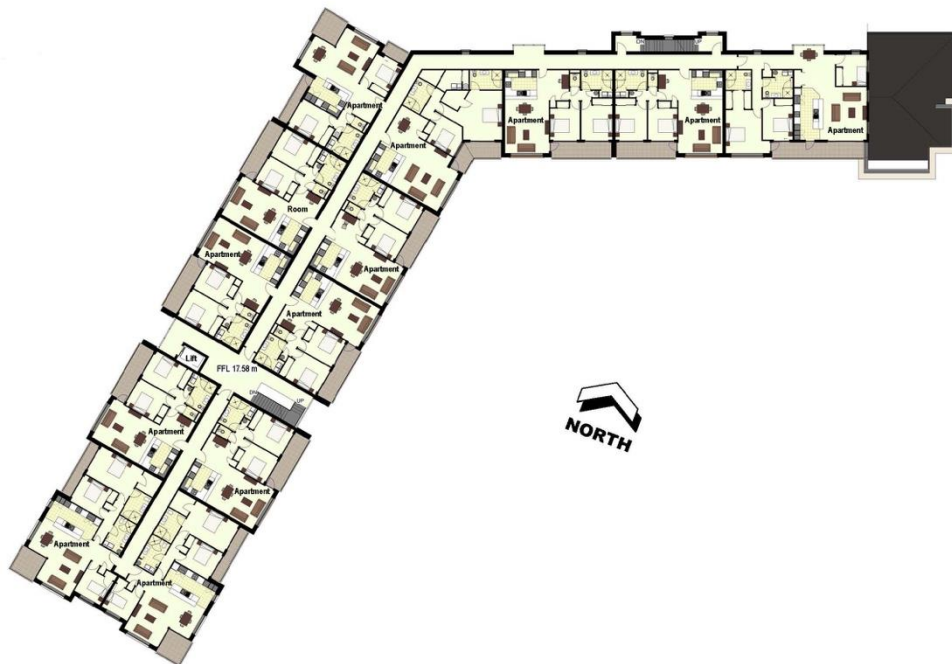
The Level 3 floor plan of Building B05 (Ryman Drawing A1-020 RC25).
